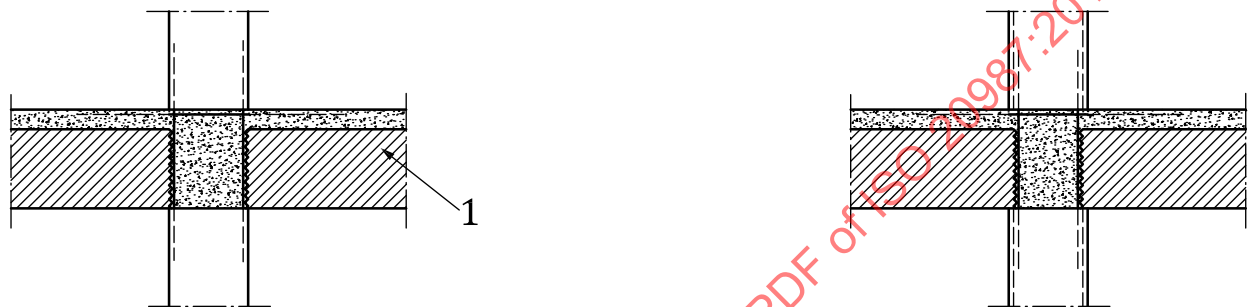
shows typical cast-in-situ connections between beams and columns placed in different positions. In case a), the connection is placed on the top of the column, from which the longitudinal bars protrude into the joint and overlap with those protruding from the beams. A concrete casting encases the overlapped bars in the joint. The size of the joint shall provide the room necessary for the required overlapping lengths. This type of connection ensures the transmission of forces and moments among the elements without large displacements. It falls within the possible critical regions of the resisting frame under seismic actions.
